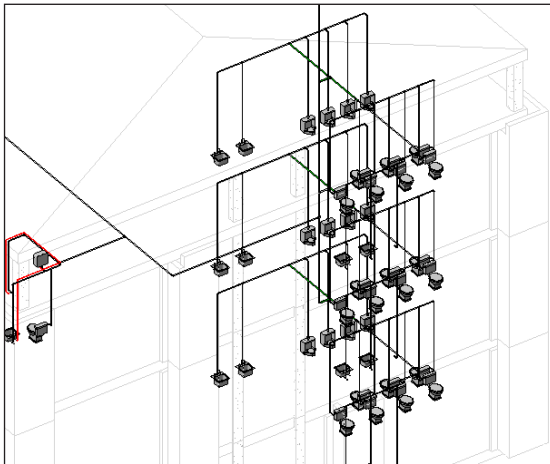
Sanitary equipment and a water supply system for three floors of the building
